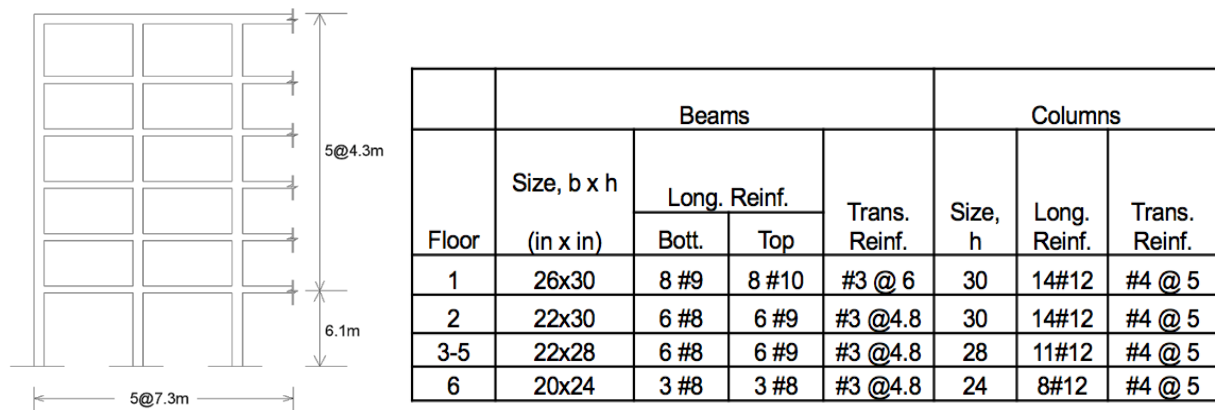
Elevation of 6-story RC frame with section and reinforcement details
